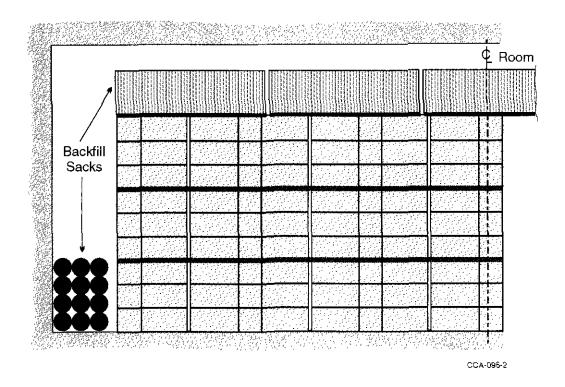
Room Cross Section Showing the Position of Backfill Sacks
